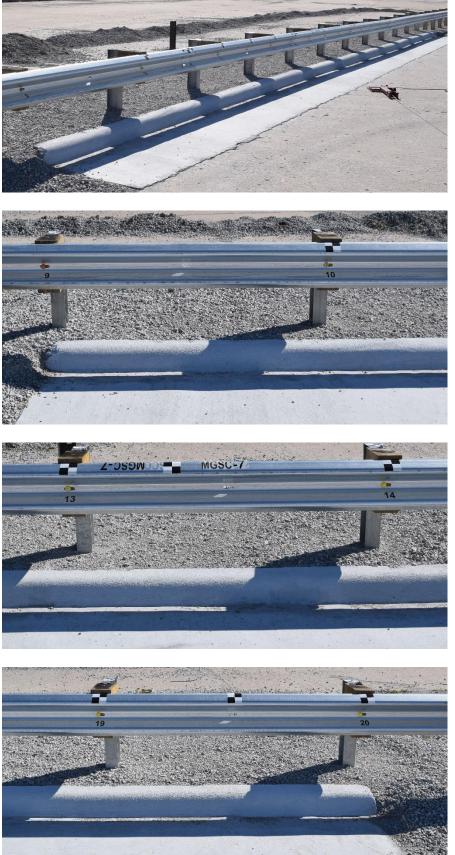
Test Installation Photographs, Test No. MGSC-7 20
